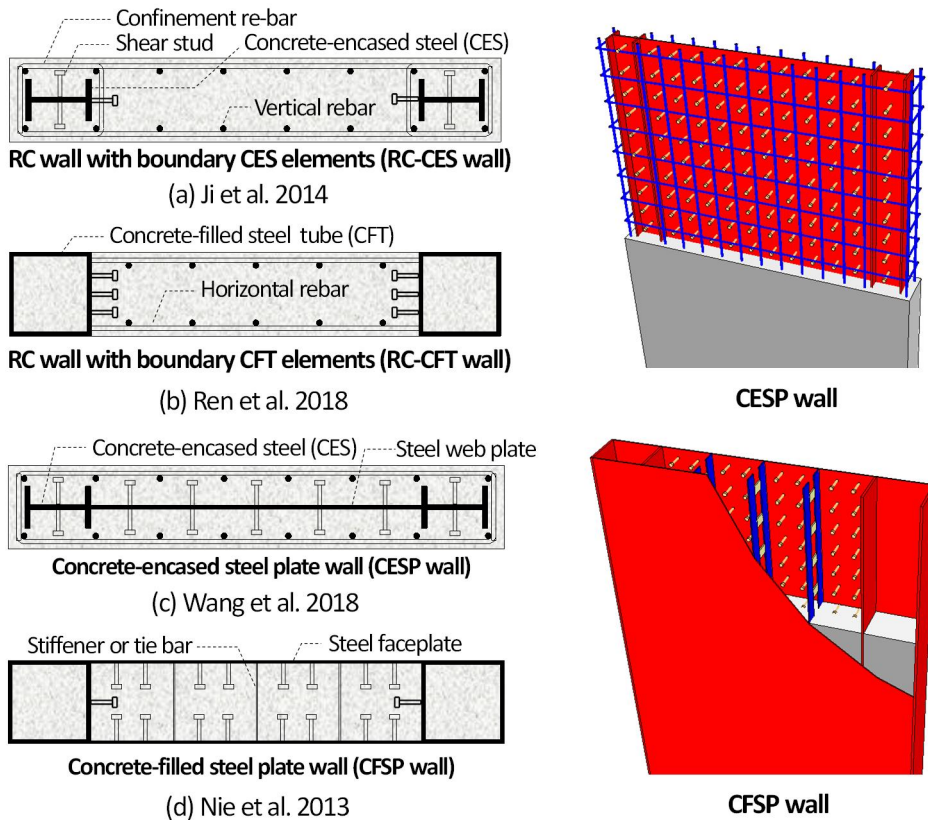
Existing steel–concrete composite walls with (a) concrete-encased steel (CES) end column; (b) concrete-filled steel tube (CFT) end column; (c) CES section and steel web plate; and (d) CFT section and concrete-filled steel faceplate.
